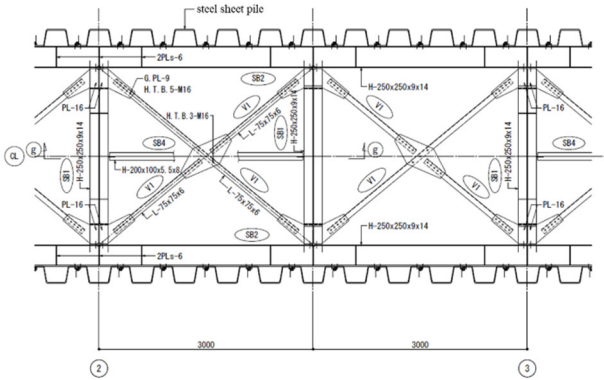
Slanted wall section (Top of trapezoidal frame)
